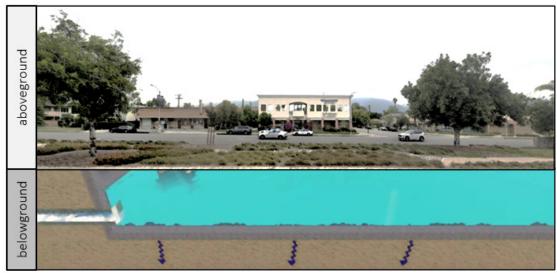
Underground Infiltration System Beneath Huntington Drive Green Street
